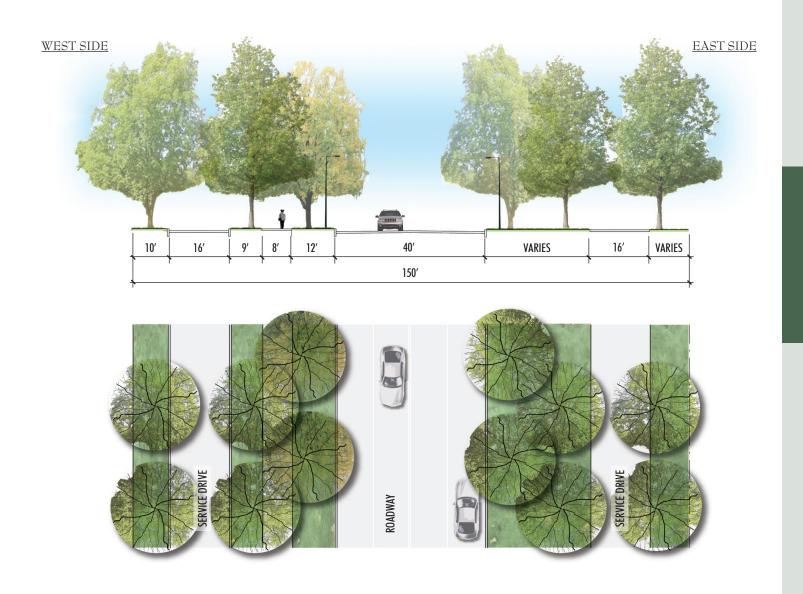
Southern Parkway: Zone 3 Existing Conditions Section and Plan
